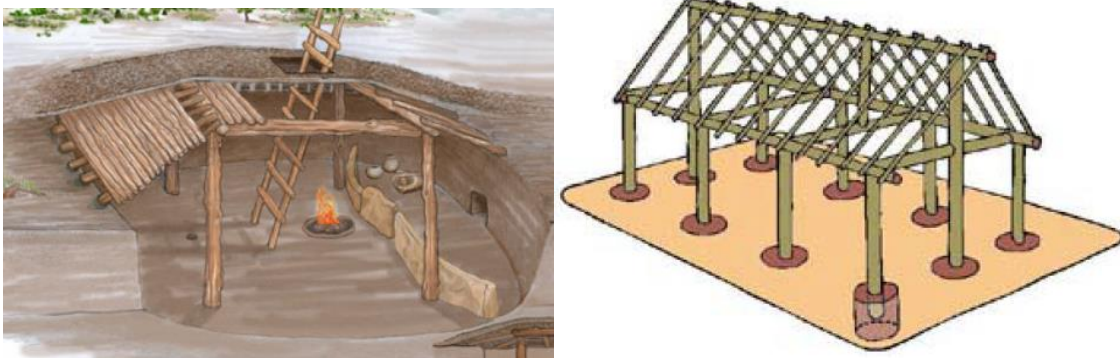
Framing of Underground pit house and level wattle and daub house. [4]
